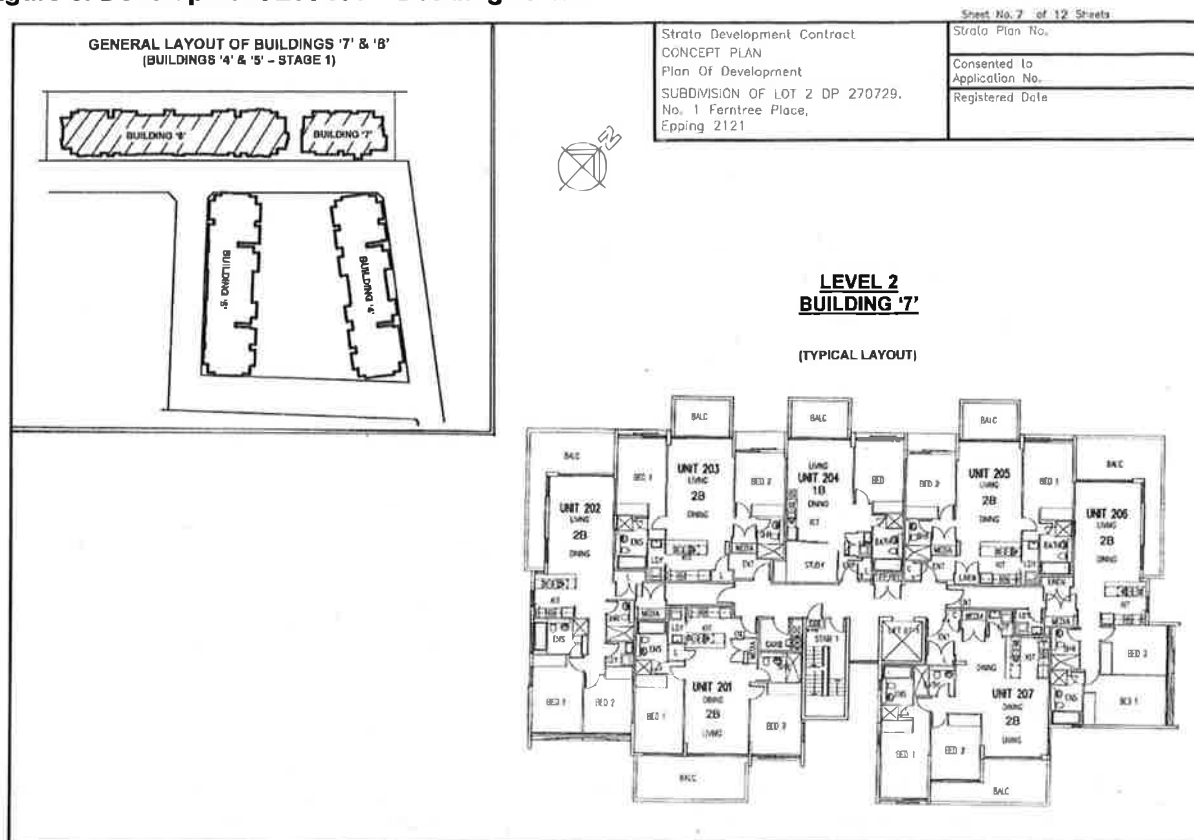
Strata Development Contract Plan for Buildings 7 & 8
